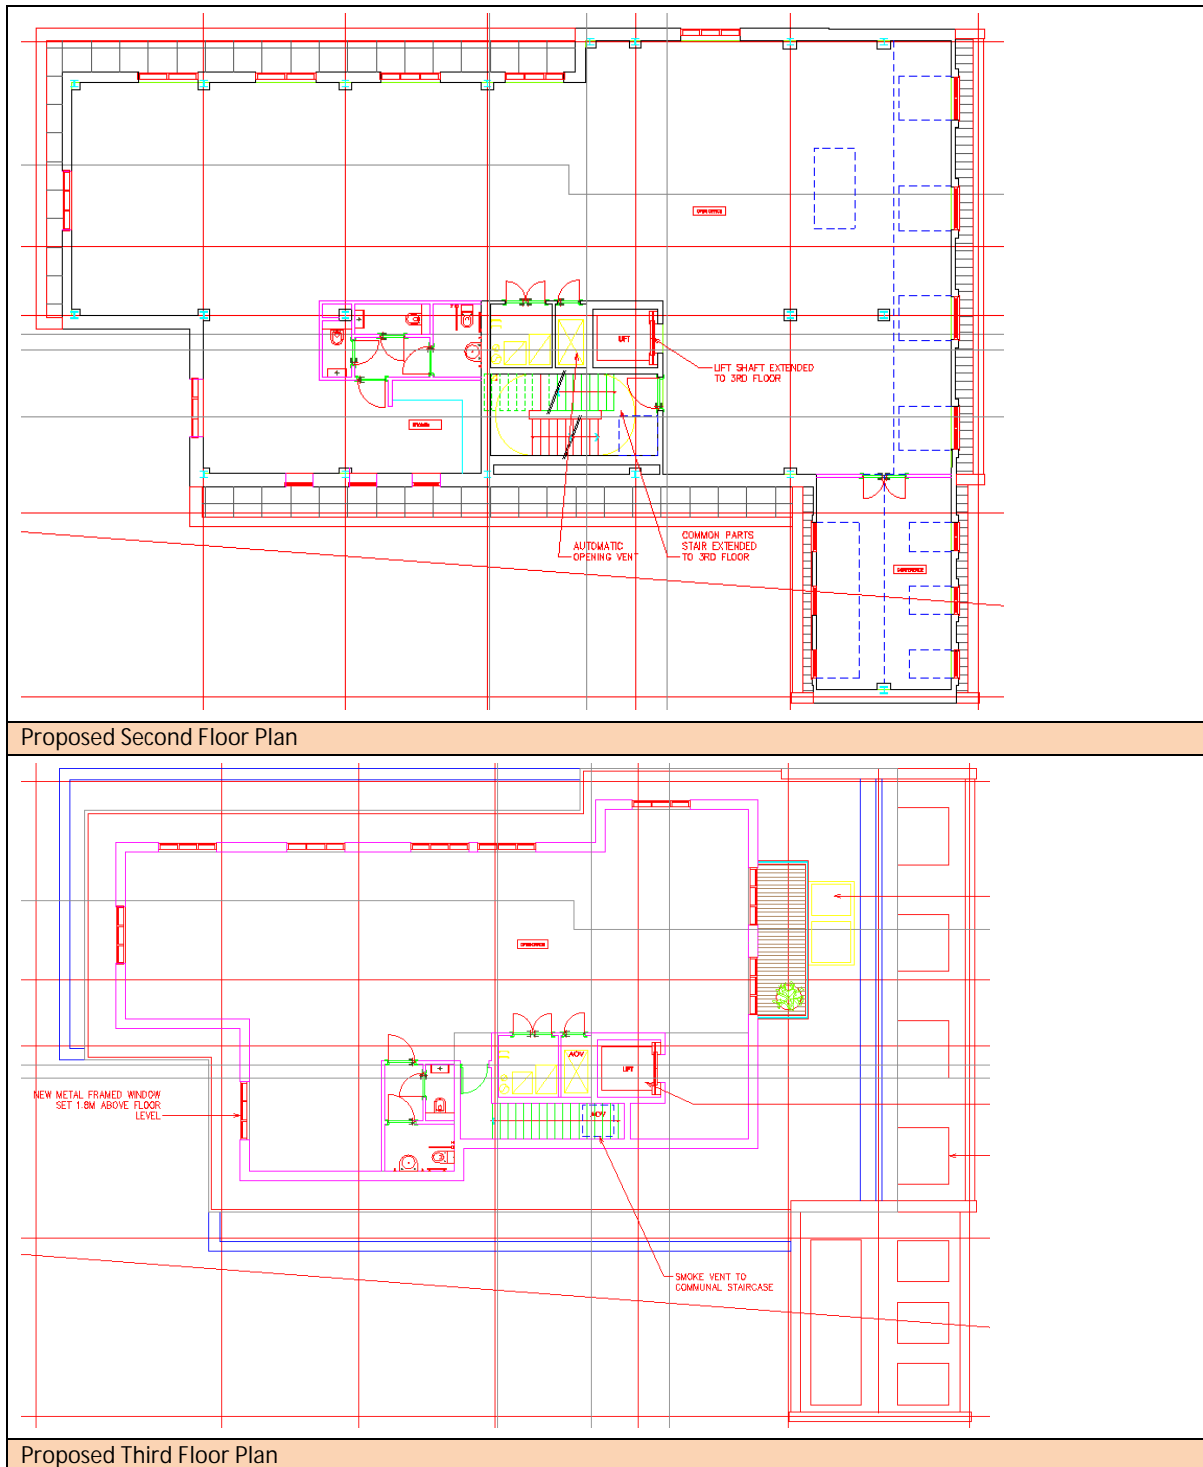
Second and third floor plans for the proposed St George's Road office extension
